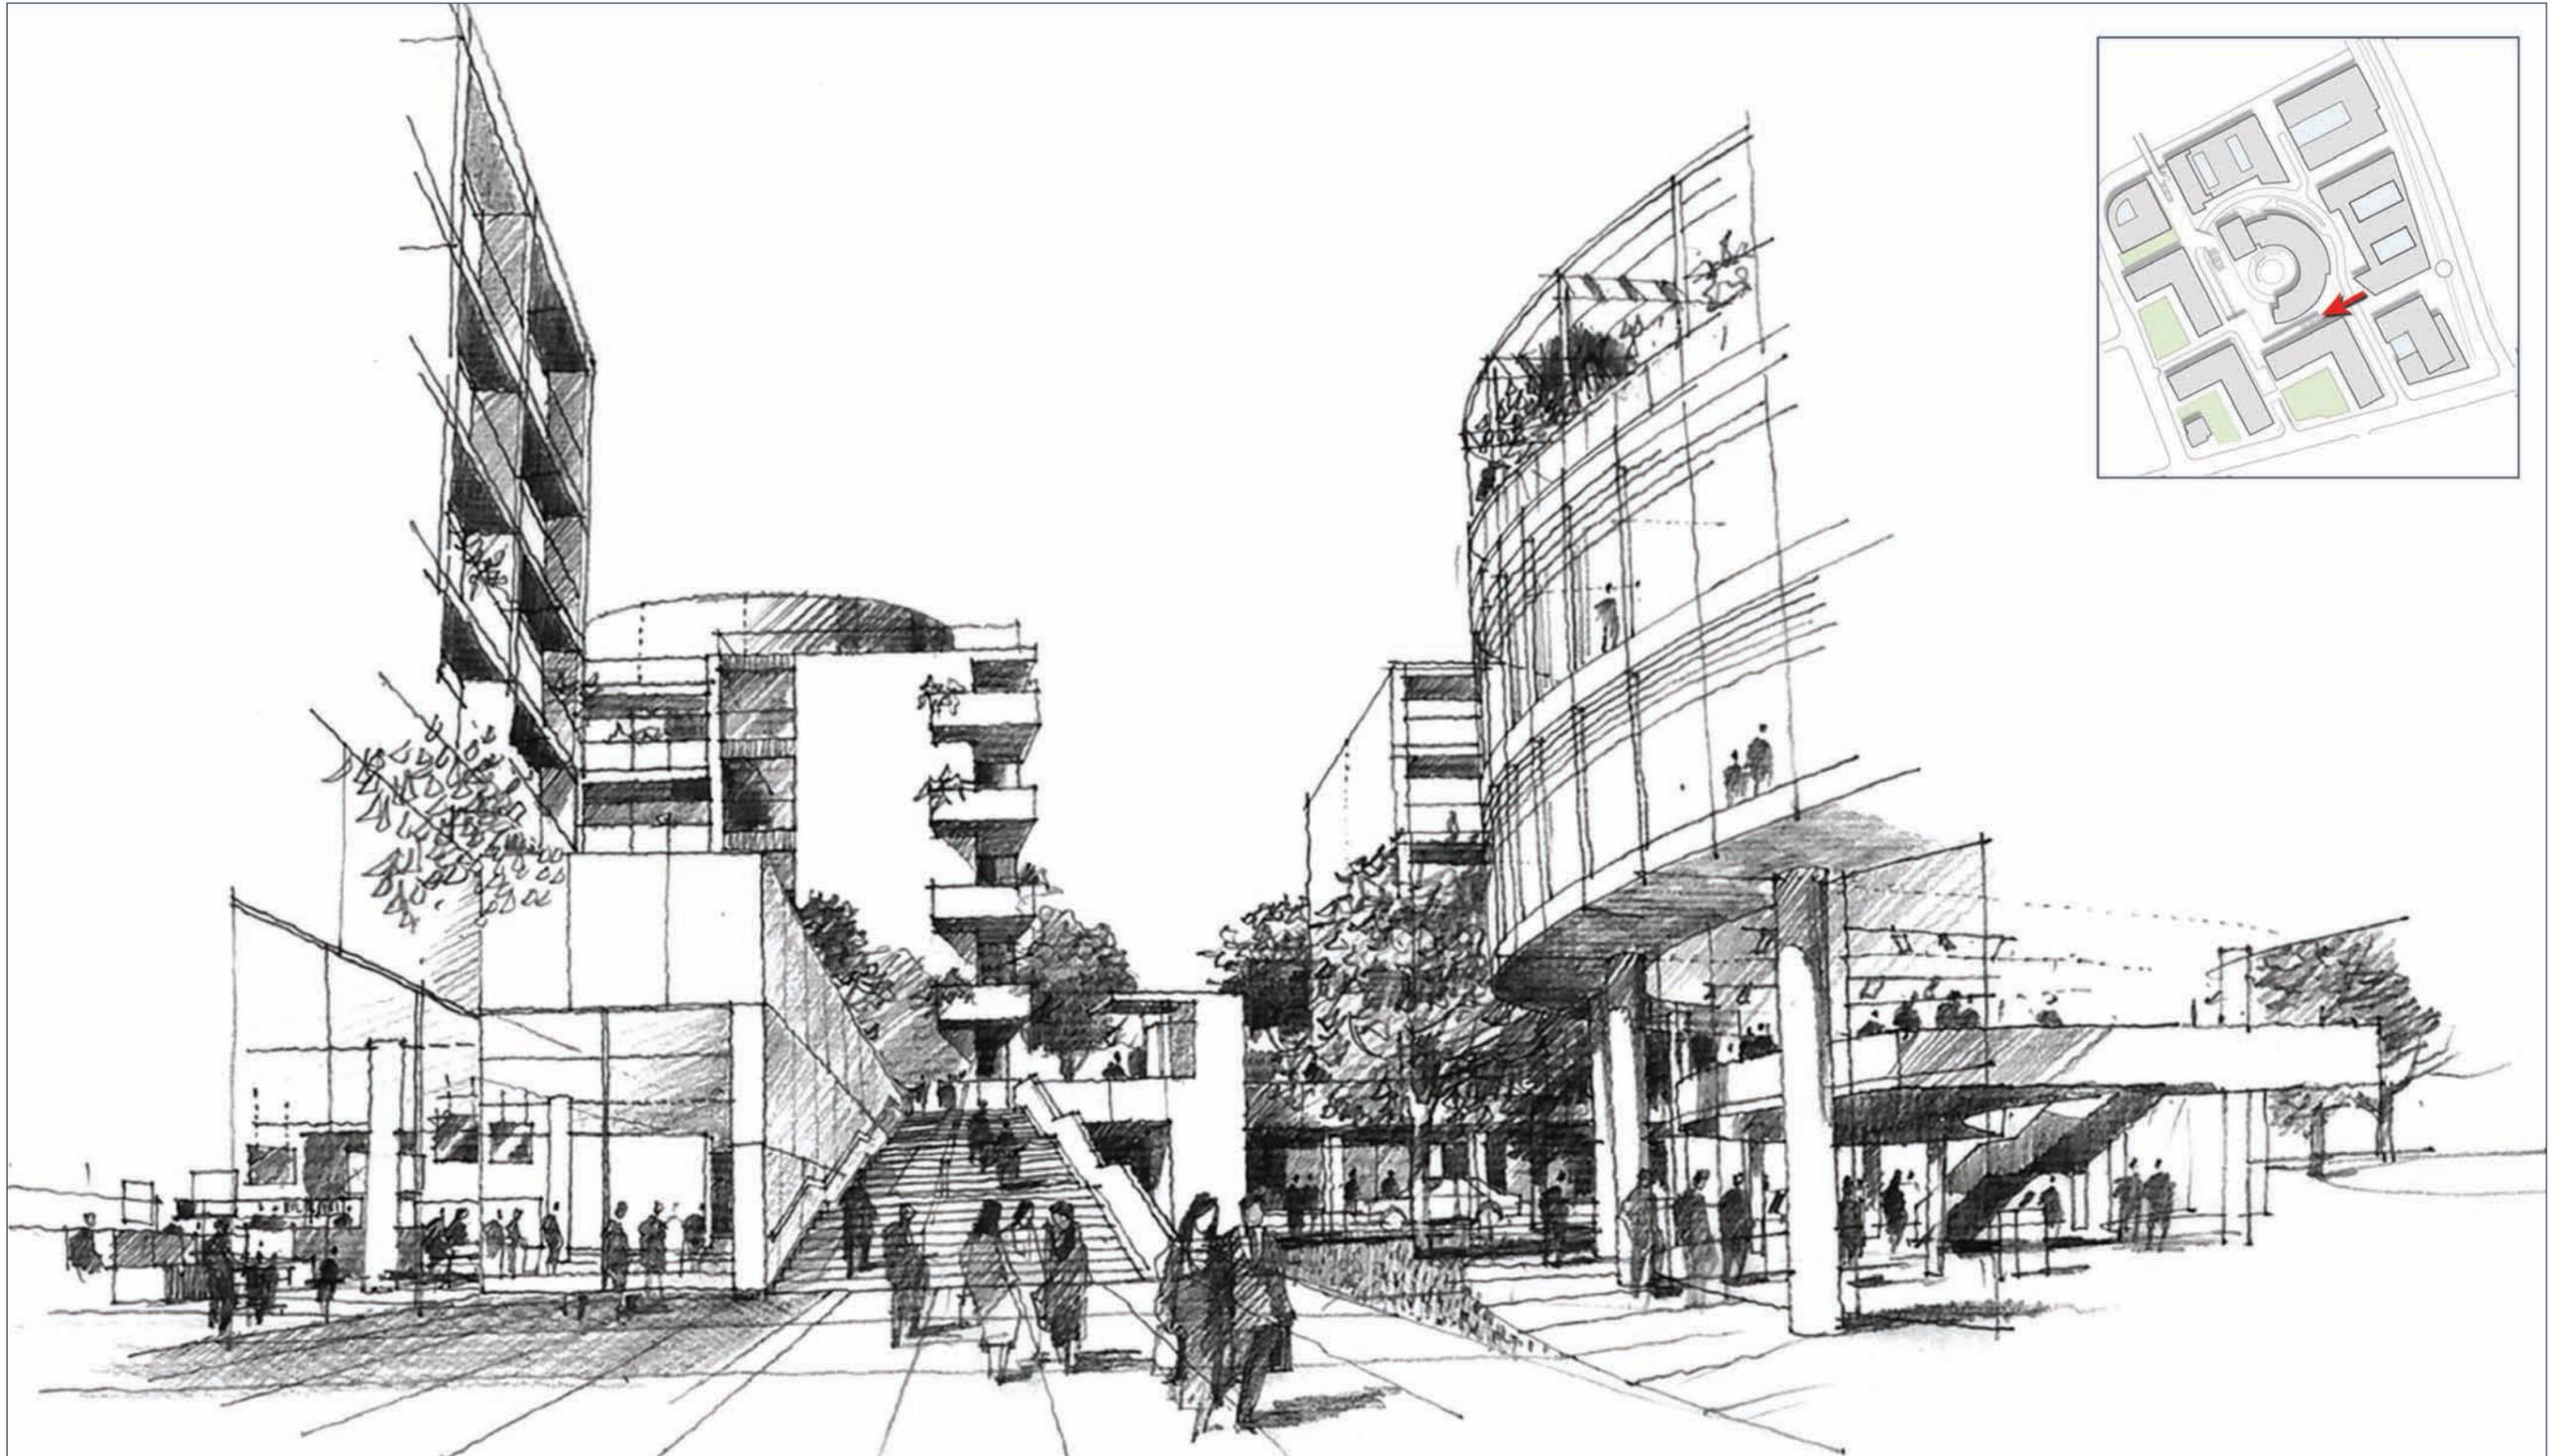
Illustrative view showing typical change of ground plane with steps and lift up towards the link over the Wyattville Link Road (block TC3 - 5) within TC3
